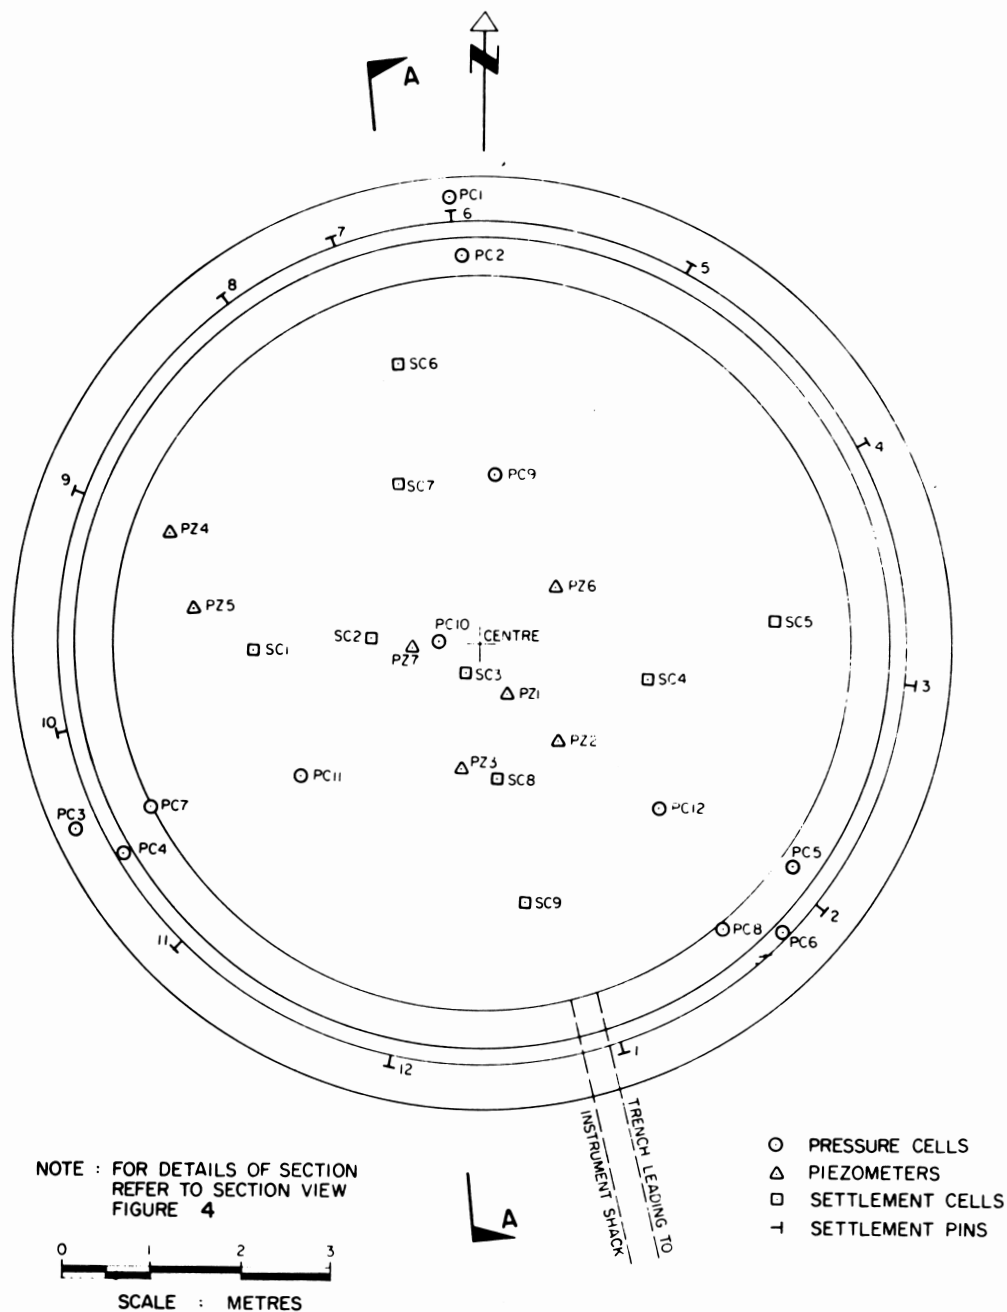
Plan of instrumentation of 9.1 x 21.9-m silo.
